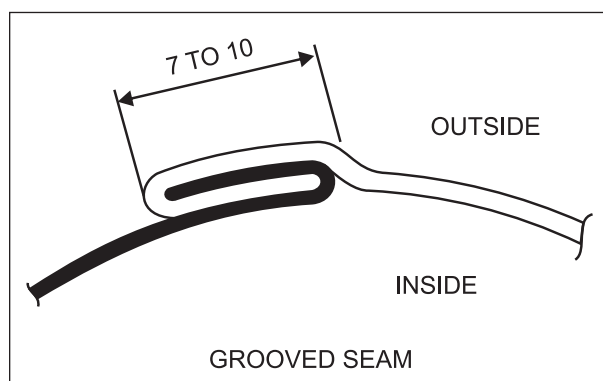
Configuration of longitudinal seam in circular duct with socket joints
